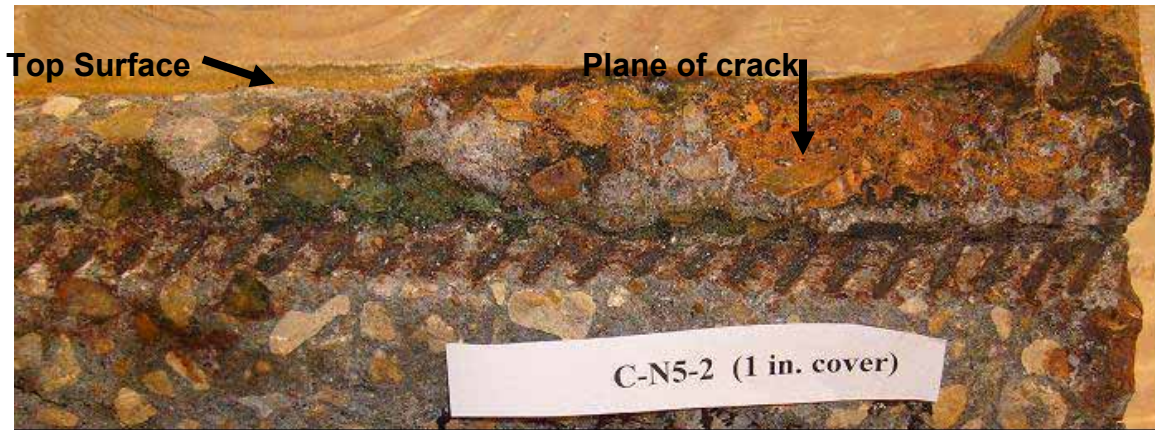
Photo. Side view of specimen Conv.-2, 25-mm (1-inch) cover, after autopsy (plane of crack visible above reinforcement).
